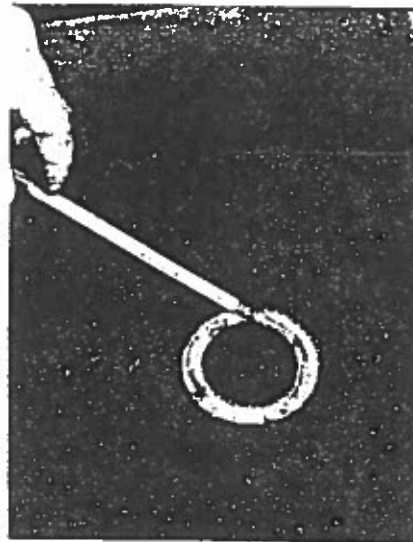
Cored disc after drilling and ready for the attachment of the pipe cap
